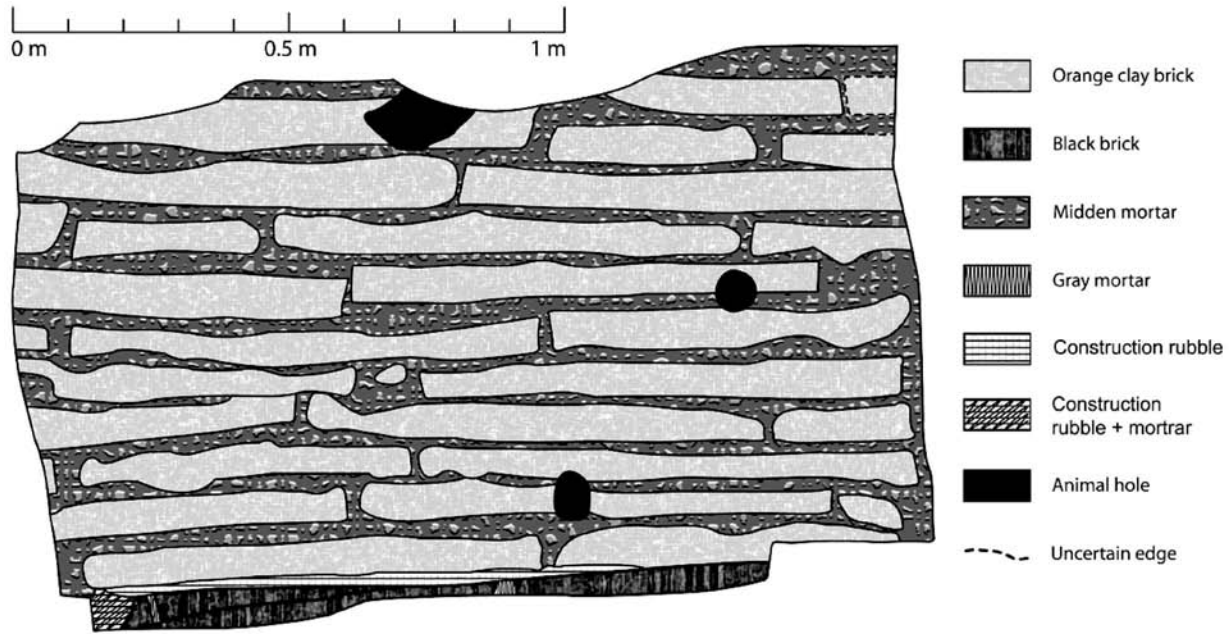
Drawing of the south wall (F.1019) of Space 88.
